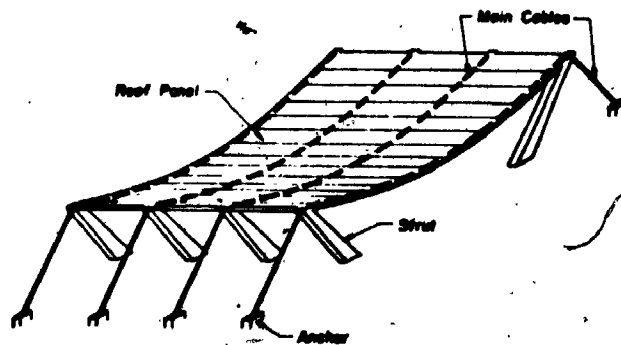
Roof Panels Installed Along Parallel Cables
